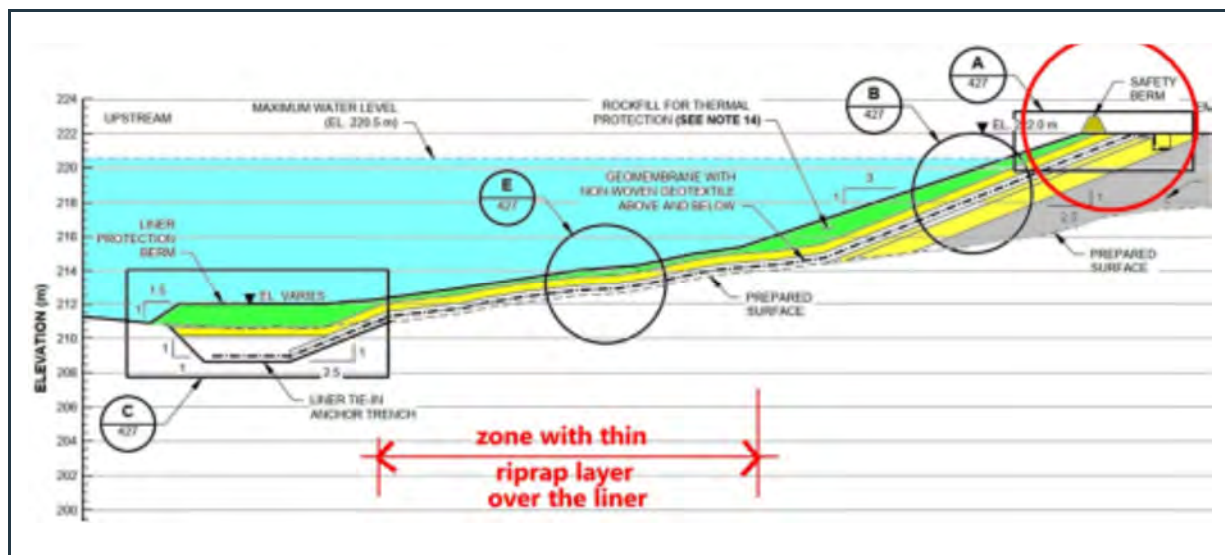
Section of the side slope in the south pond. – Source: KM105 Sedimentation Pond Design Brief and Issued for Construction Drawings – Knight Piésold Ltd. 2021
